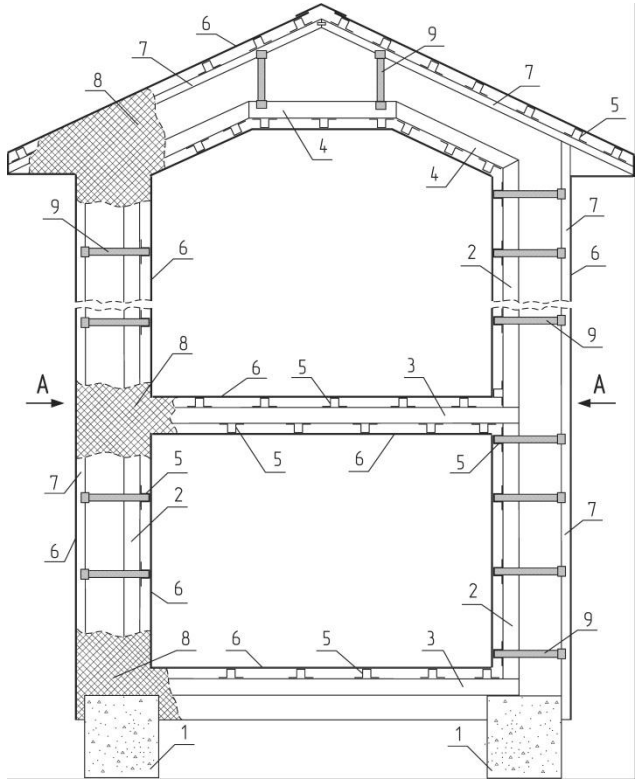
Cross-sectional view of the building: 1 – foundation; 2 – column of internal frame; 3 – cross-beam of internal frame; 4 – flooring beam; 5 – formed stud; 6 – formwork board; 7 – external frame; 8 – lightweight concrete; 9 – temporary spacer.
